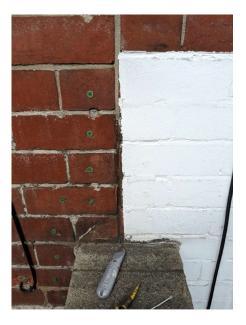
Pointing to the party wall above the front LHS boundary wall.
